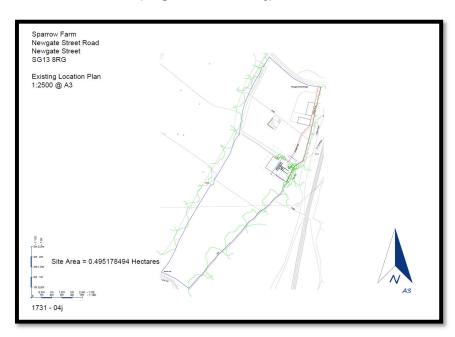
Site Location Plan (Drg. No. 1731-04j)
